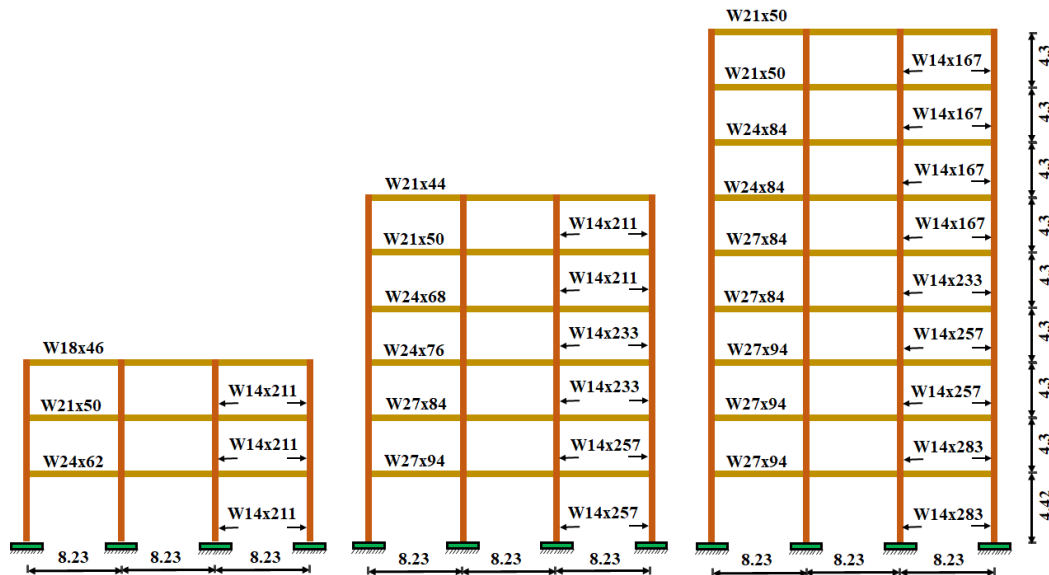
Elevation and section arrangement of the 3, 6, and 9 story SMRF buildings
